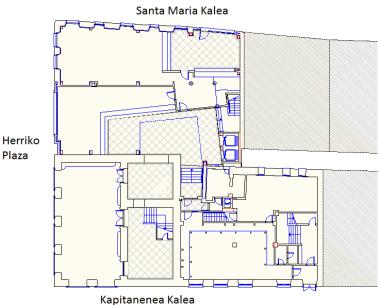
CITY HALL'S GROUND FLOOR PLAN VIEW
